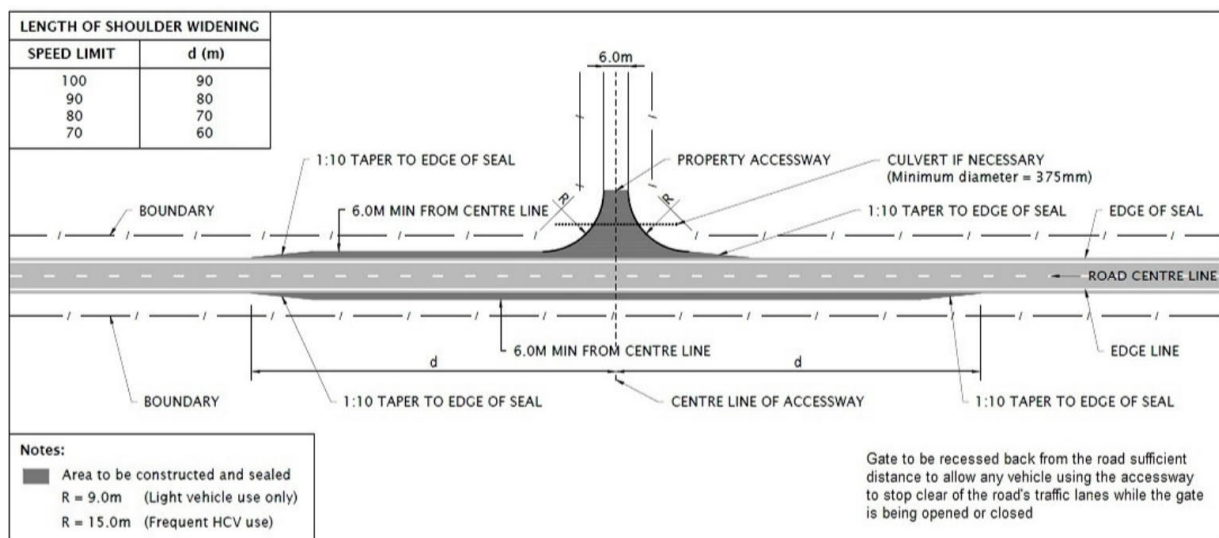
Figure 14 Appendix 7.5.10 Design of rural vehicle crossings – Christchurch District Plan
